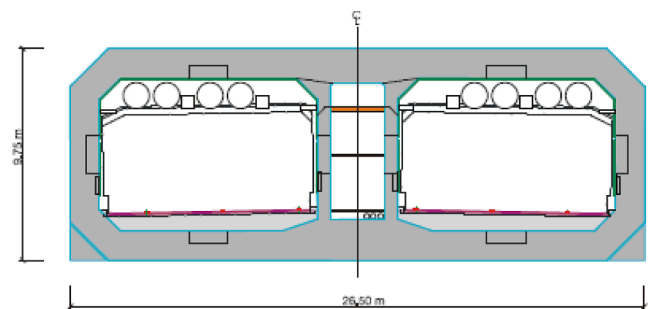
Typical Tunnel Cross Section, Standard Elements.
